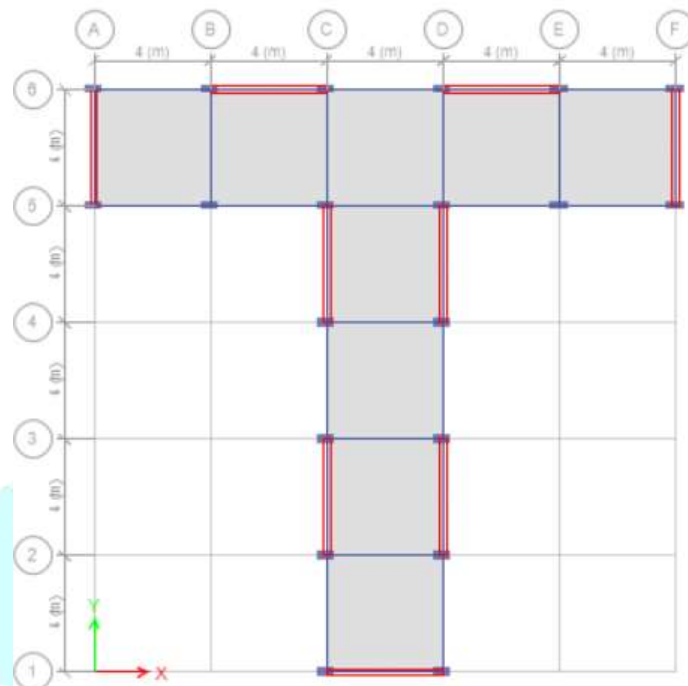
IRREGULAR PLAN MODEL WITH RCC COLUMNS WITH SHEAR WALL
